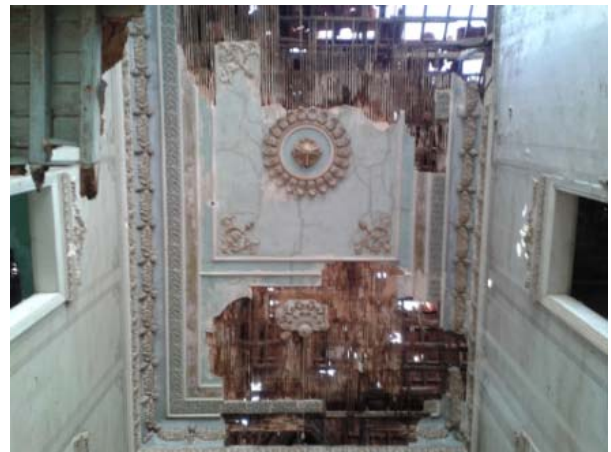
Timber cut beam in the central hall with adorned ceiling (idem).
